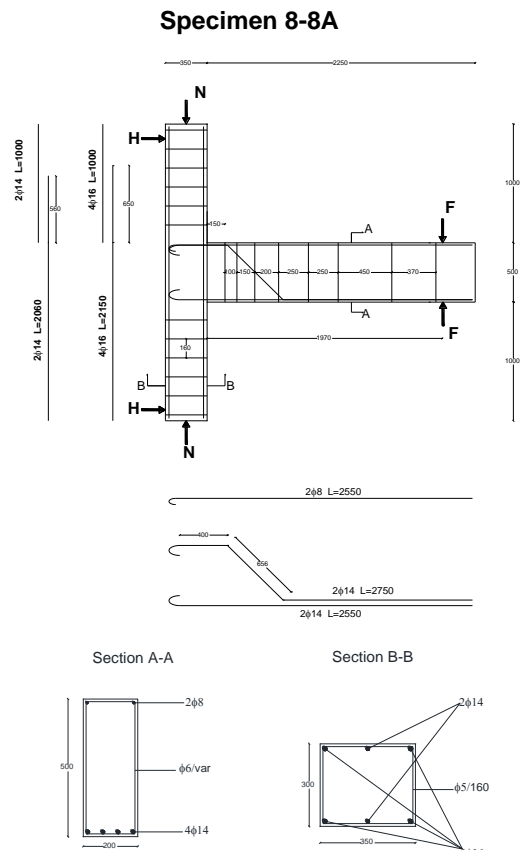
External RC joint tested in Russo and Pauletta (2012)
